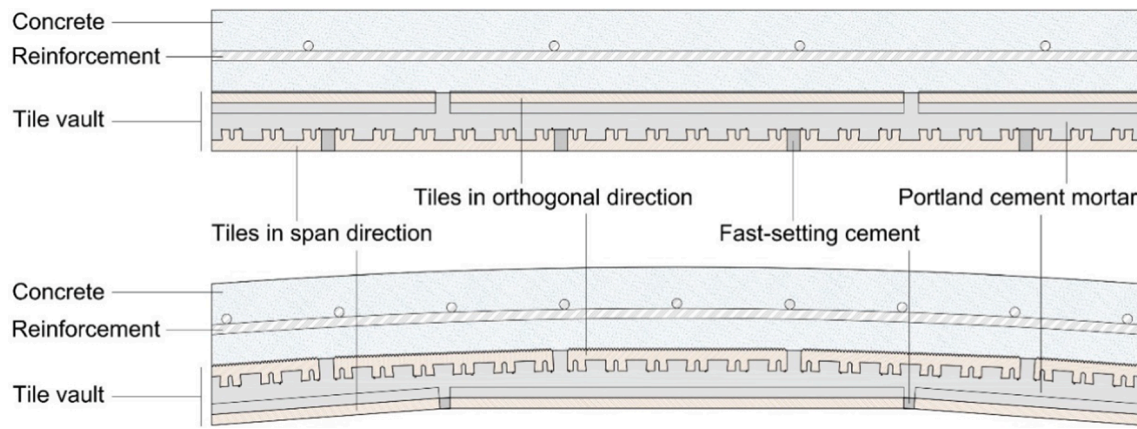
Cross-sections of a barrel vault using the proposed construction system. Top) Transversal cross-section, bottom) longitudinal cross-section. [41].
